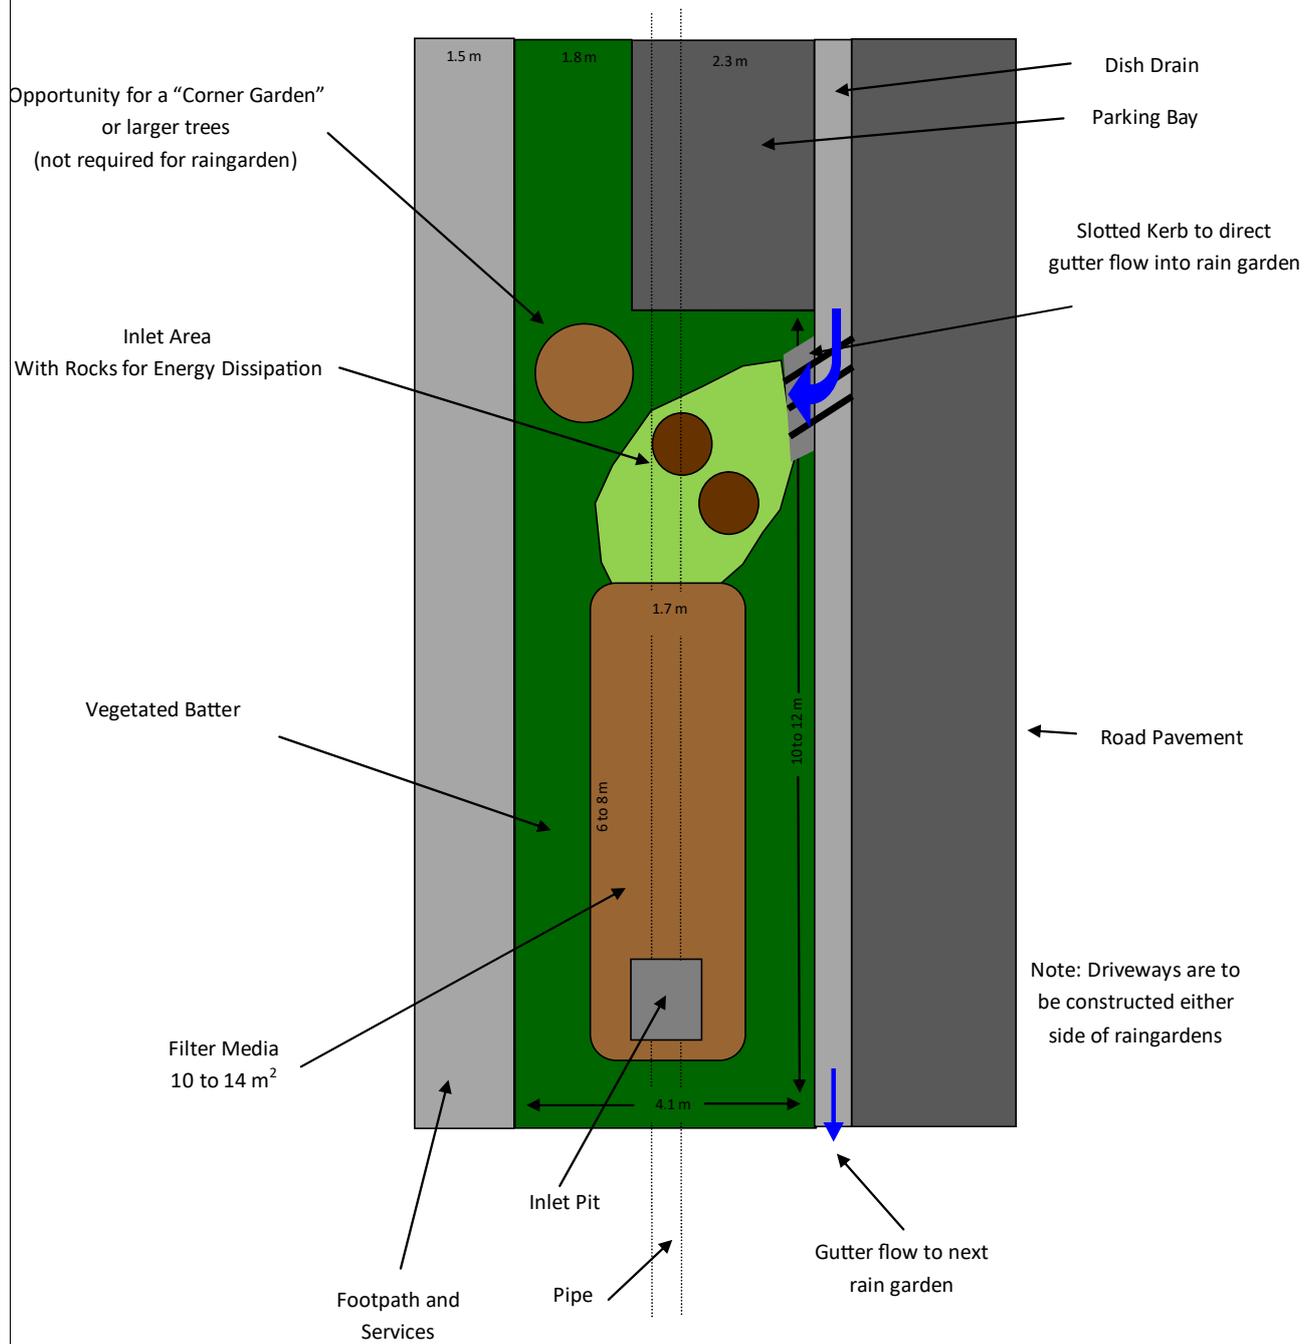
Typical plan view concept of a street scape raingarden in Zone D4
